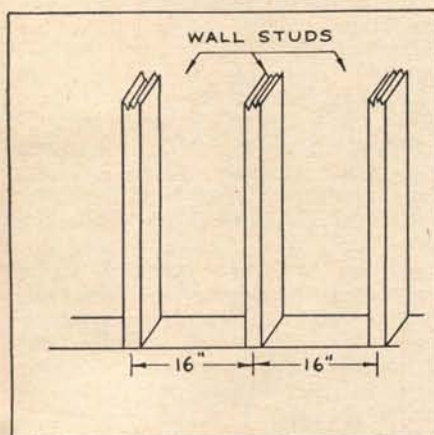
Standard spacing of wall studs—16 inches center to center.
